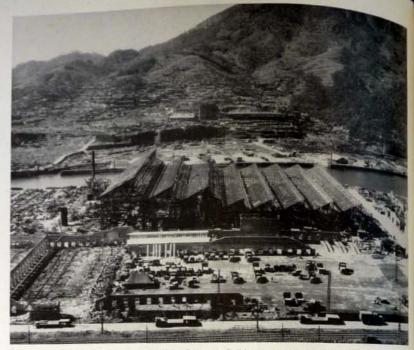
5,600 feet from GZ. Group 36, Building 8. Aerial view, looking west.
